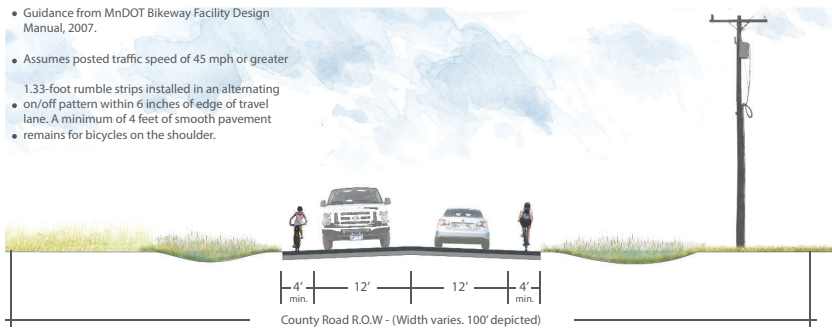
Shoulder Width Guidance: Less than 1000 AADT
